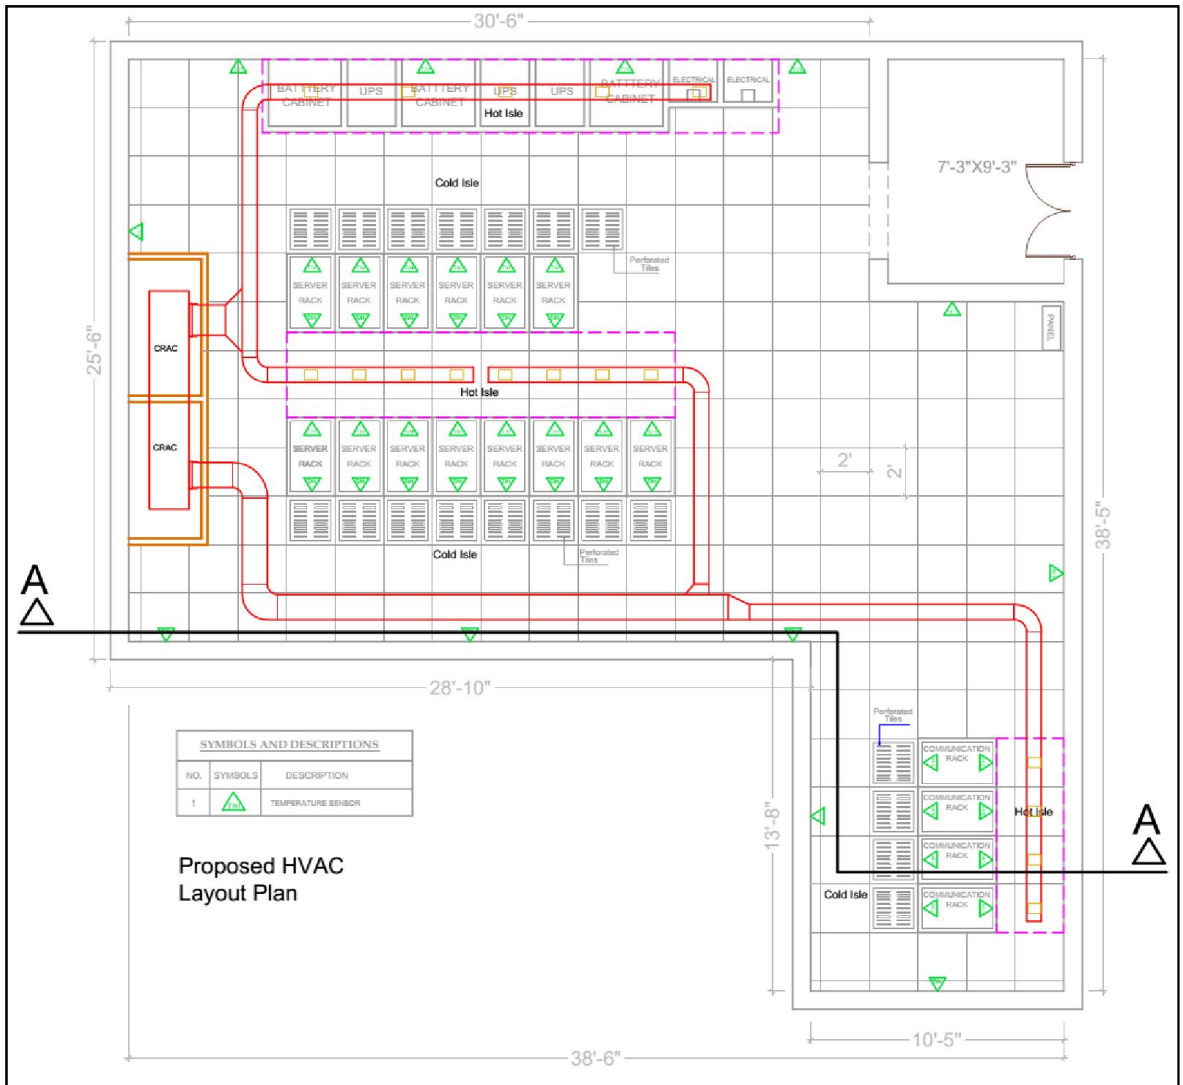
SECS Data Centre Proposed HVAC Layout Plan
